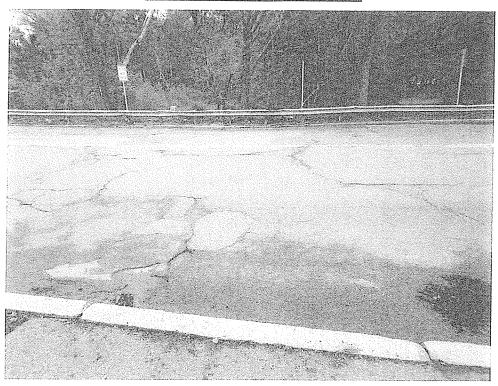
Typical wearing surface photo showing heavy cracking throughout.
